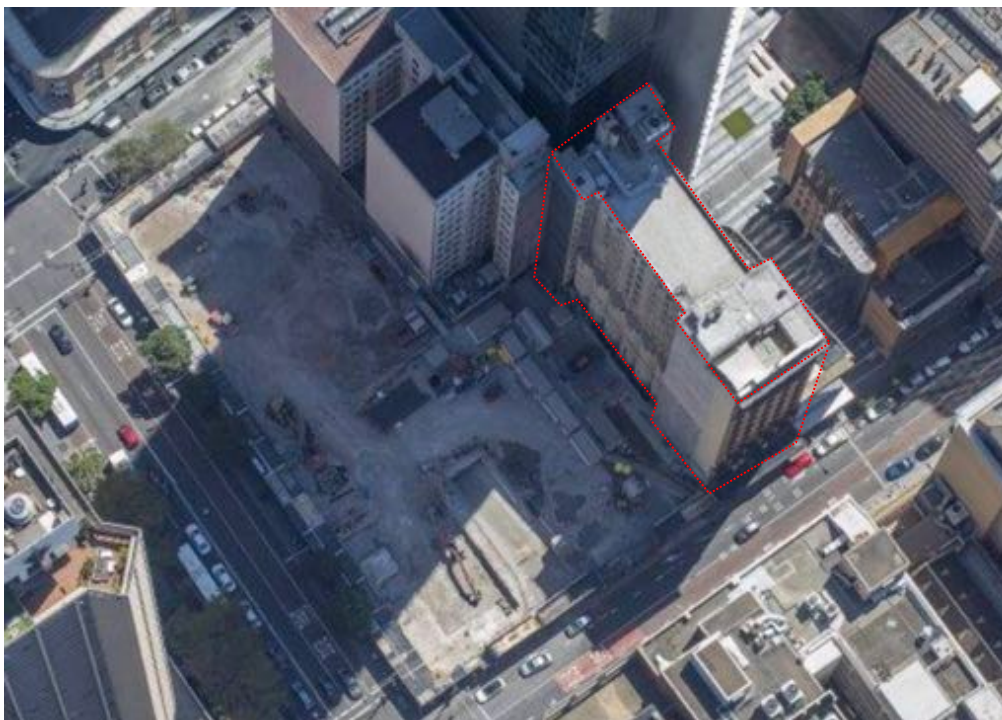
Aerial photograph showing Pitt Street North Metro Station and OSD and NSW Masonic Club. 2018.
